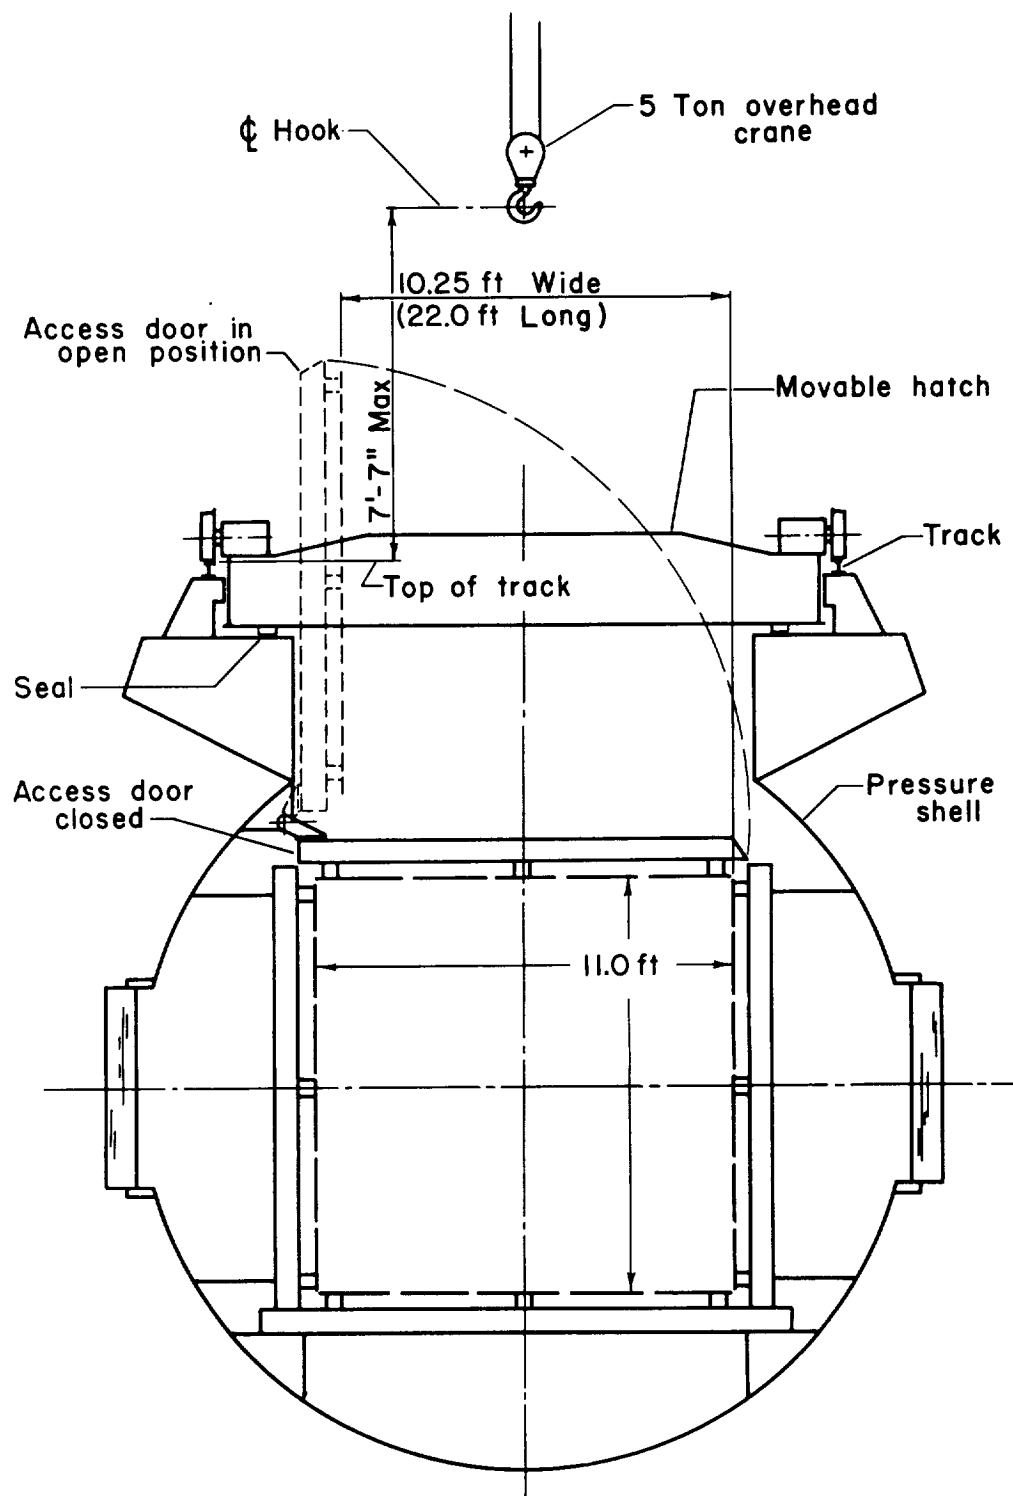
Access hatch dimensions; 11- by 11-foot transonic test section, Ames Unitary Plan Wind Tunnel.
